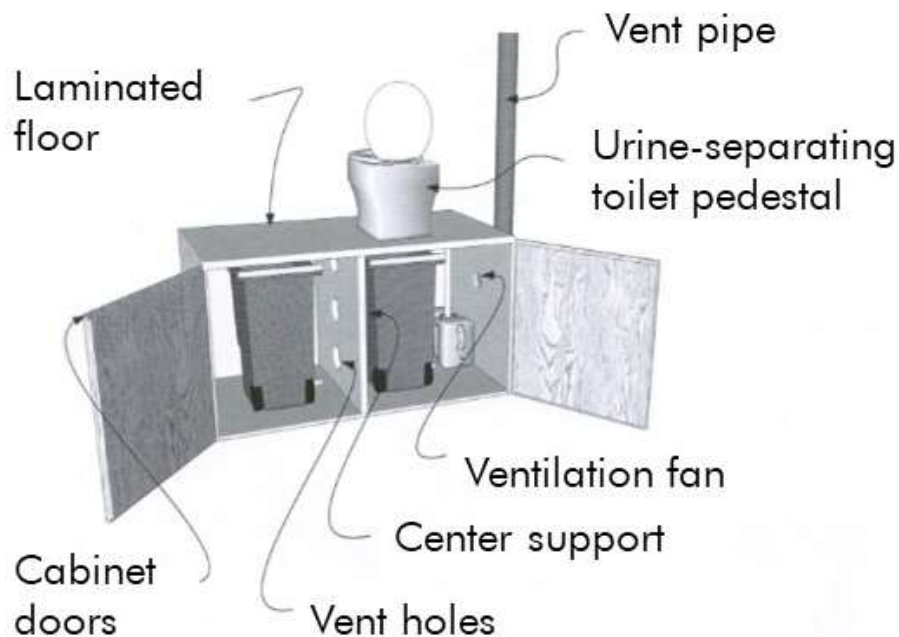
The design of the toilet is a moldering toilet with vented cabinet (drawing modified from [124]). The cabinet is vented with a solar-powered fan. The urine-diversion seat is a Separett Privy 500.
